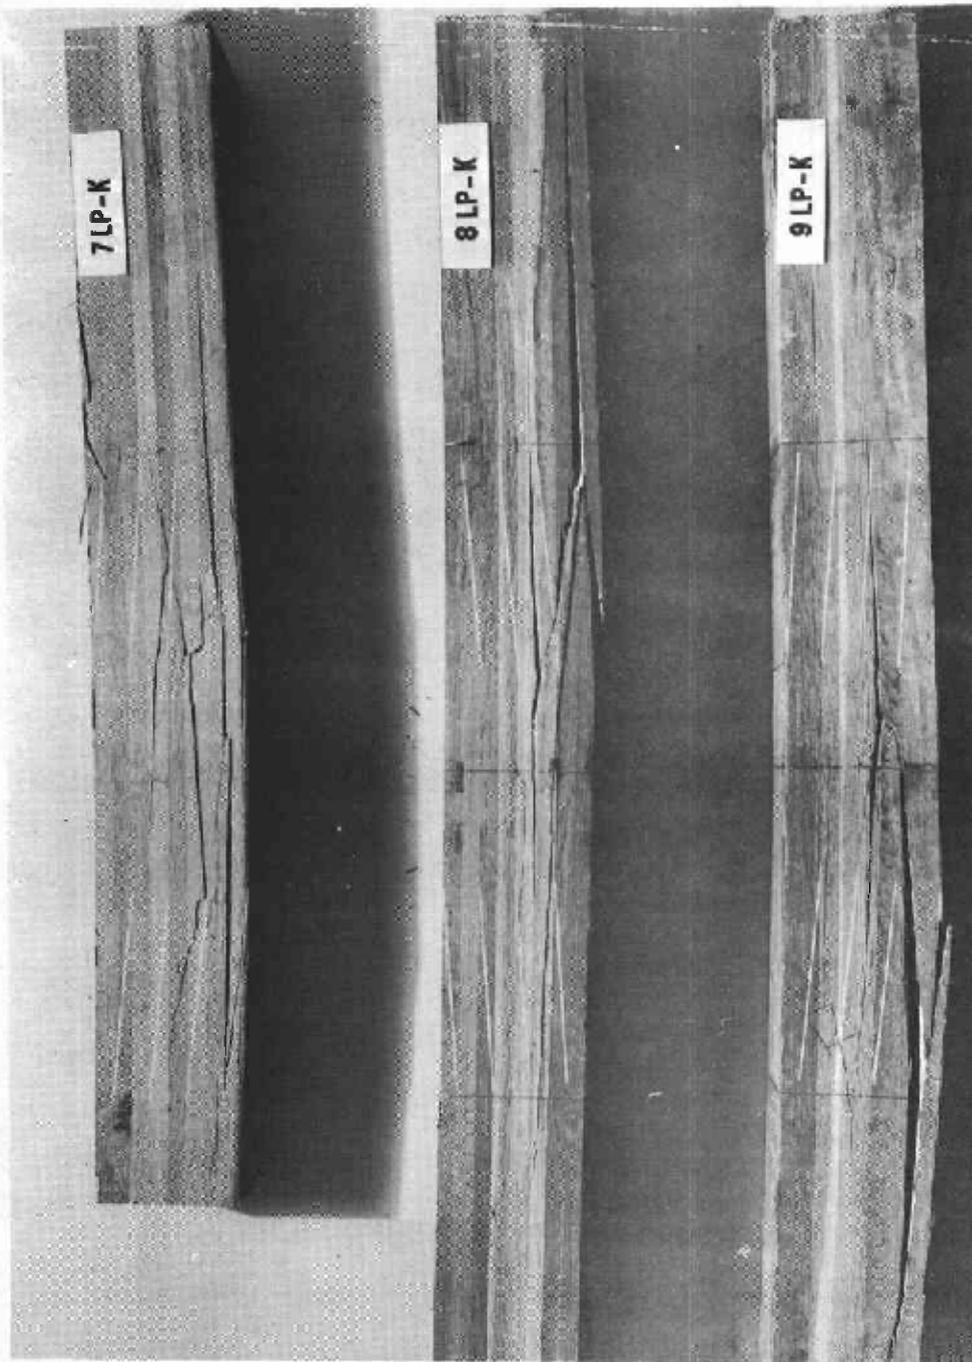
Side view of failed laminated keel sections with plain scarf joints of slope 1 in 12. Typical failure is a simple-to-splintering tension and some opening of scarf joint usually in outer lamination on tension side.
